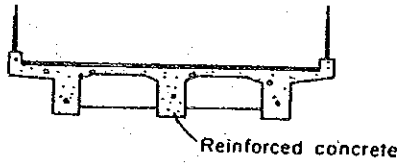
Proposed Structural plans for Quebrada Areas
